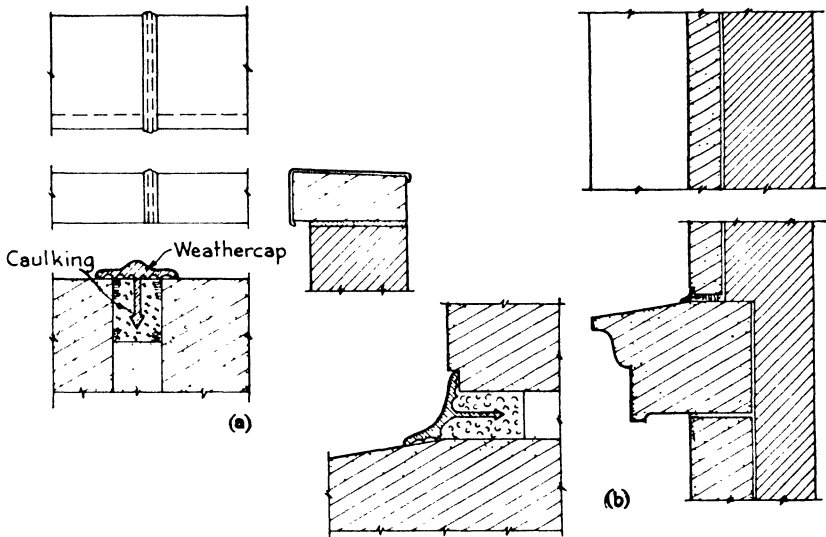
Minwax Weather Caps. (a) joints in horizontal surfaces; (b) joints in vertical surfaces at belt courses.
